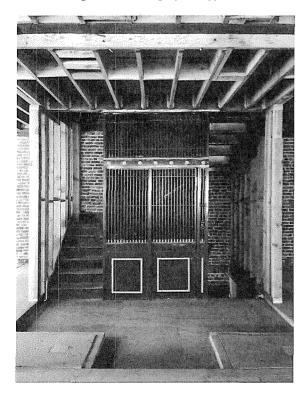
Detail view of stairs and elevator with ornamental metal cage at southern wall. Note differential settlement of elevator landing from the remainder of the building (photograph taken on 02/27/2018).
